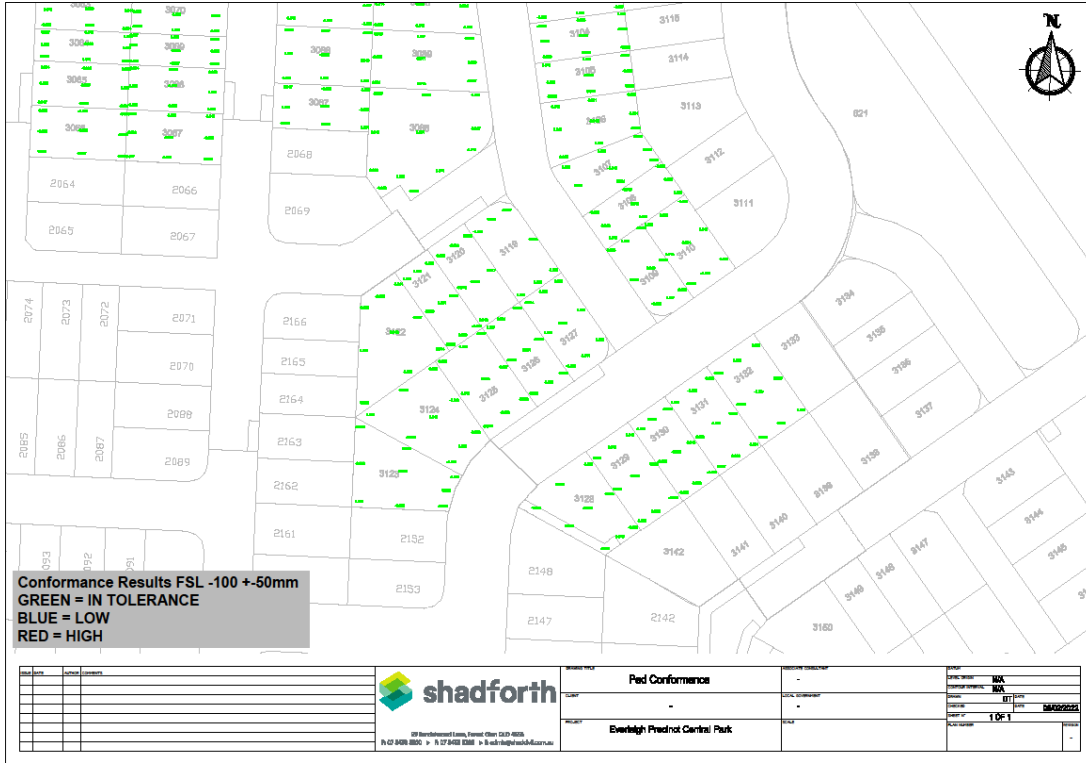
Actual Constructed Area of Fill – Shadforth Survey Plans
